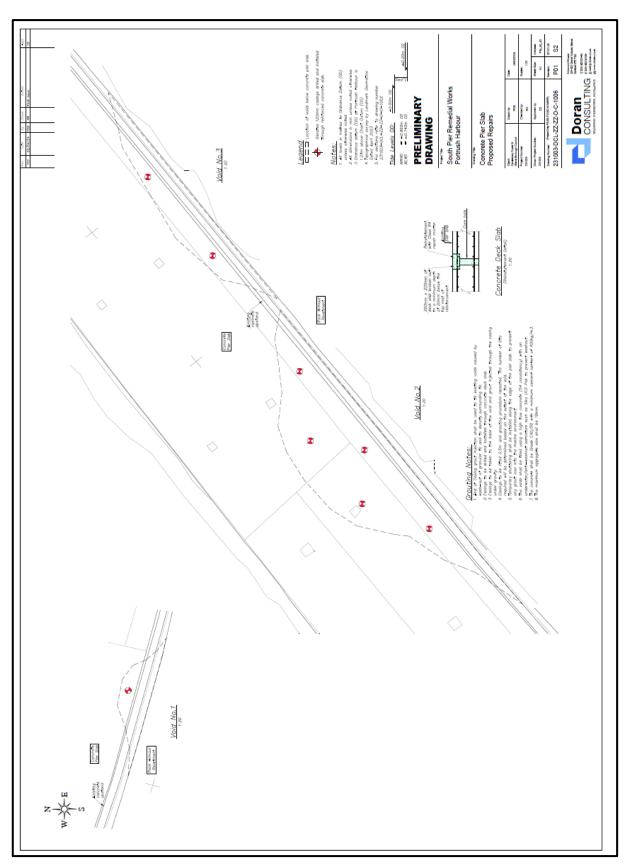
Concrete Pier Slab Proposed Repairs, Portrush South Pier
